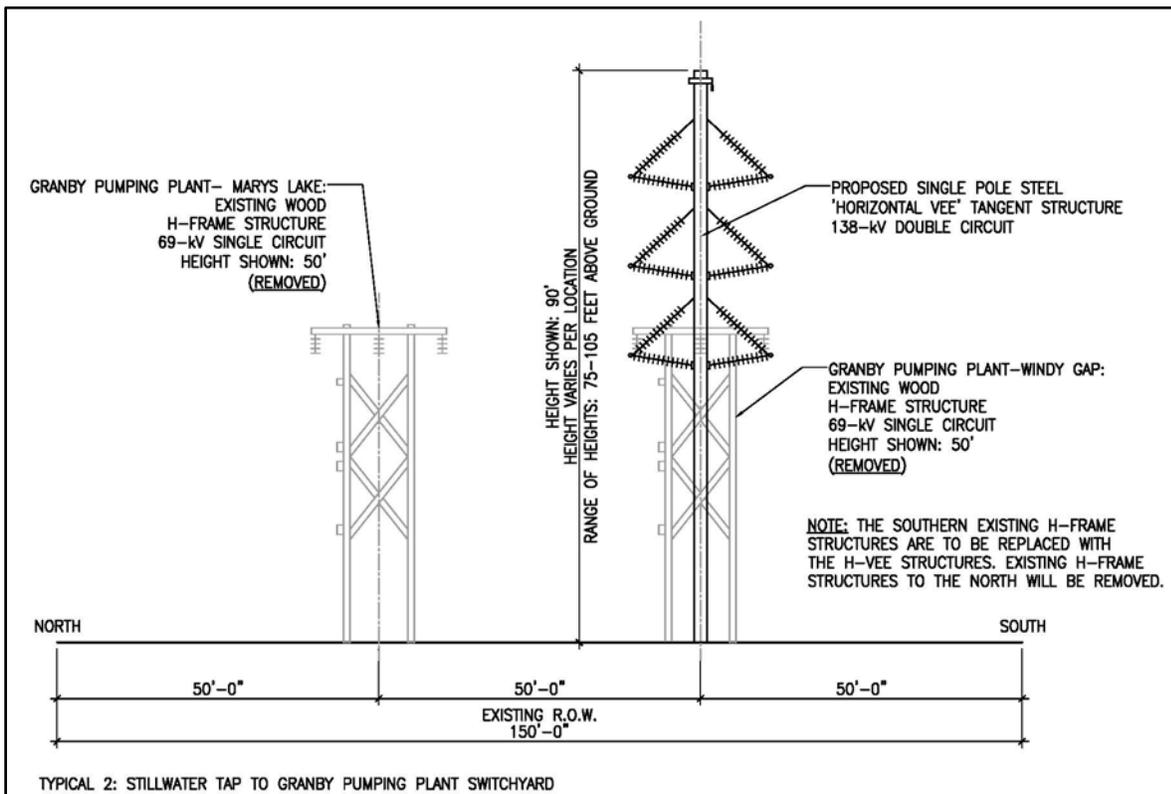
Typical Profile of Existing Parallel ROW Versus New Single ROW Leaving Stillwater Tap towards Granby Pumping Plant Switchyard.
